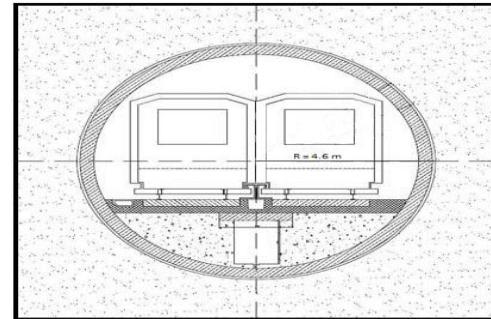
The final section of Tehran Subway tunnel at the second line[iii].
